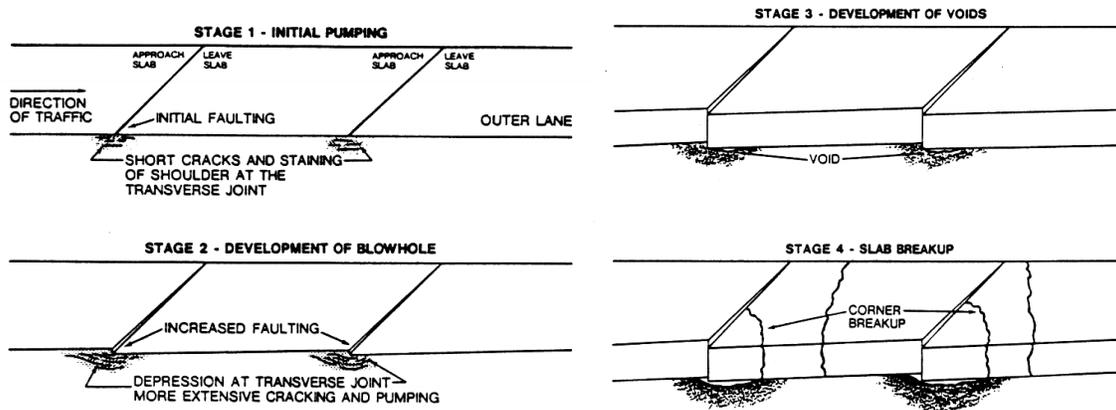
Loss of slab support due to poor drainage and associated cracking (from Darter et al. 1985)
